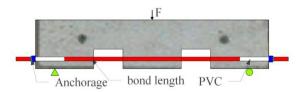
Schematic illustration of beam anchorage specimen for bond tests
